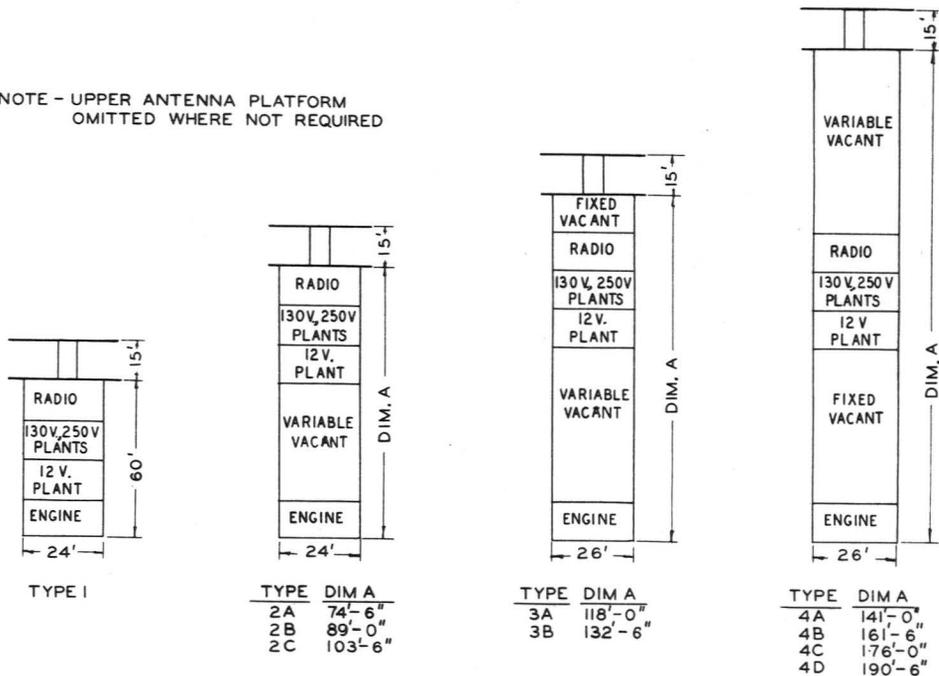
Standard Square Buildings - Elevation Plans Radio Repeater Stations
